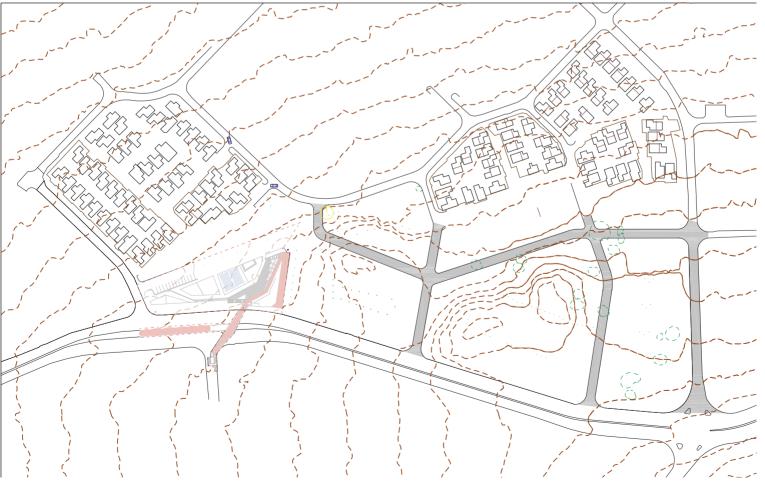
Masterplan, Final proposal with the existing public space of the urban block. Author, 2017
